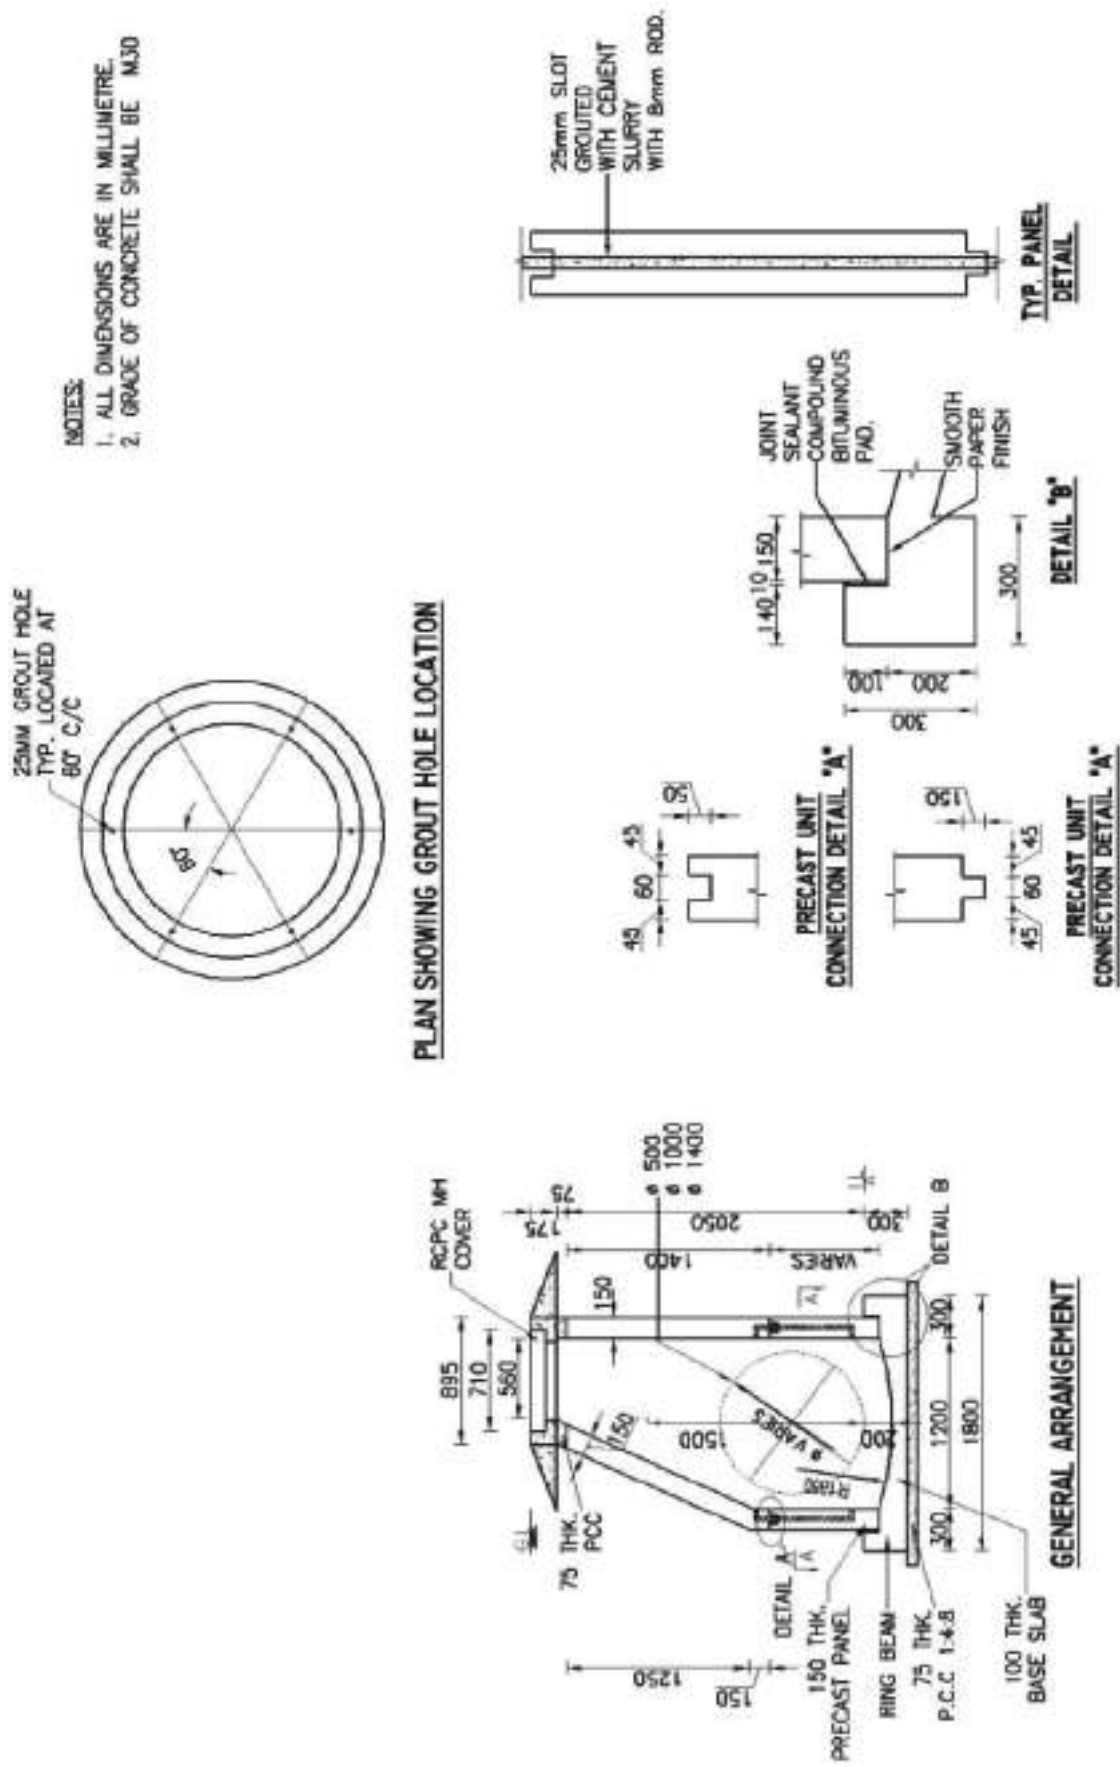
RCC Manhole for a depth between 0.6 m to 2.3 m
